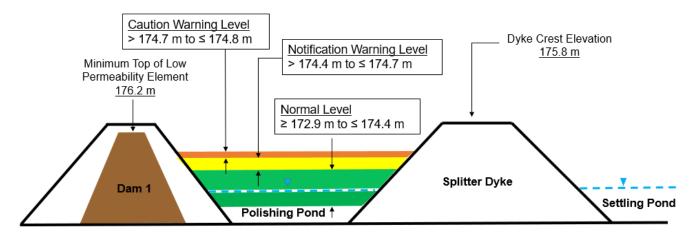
Water and Infrastructure Elevations for Polishing Pond (not to scale)
